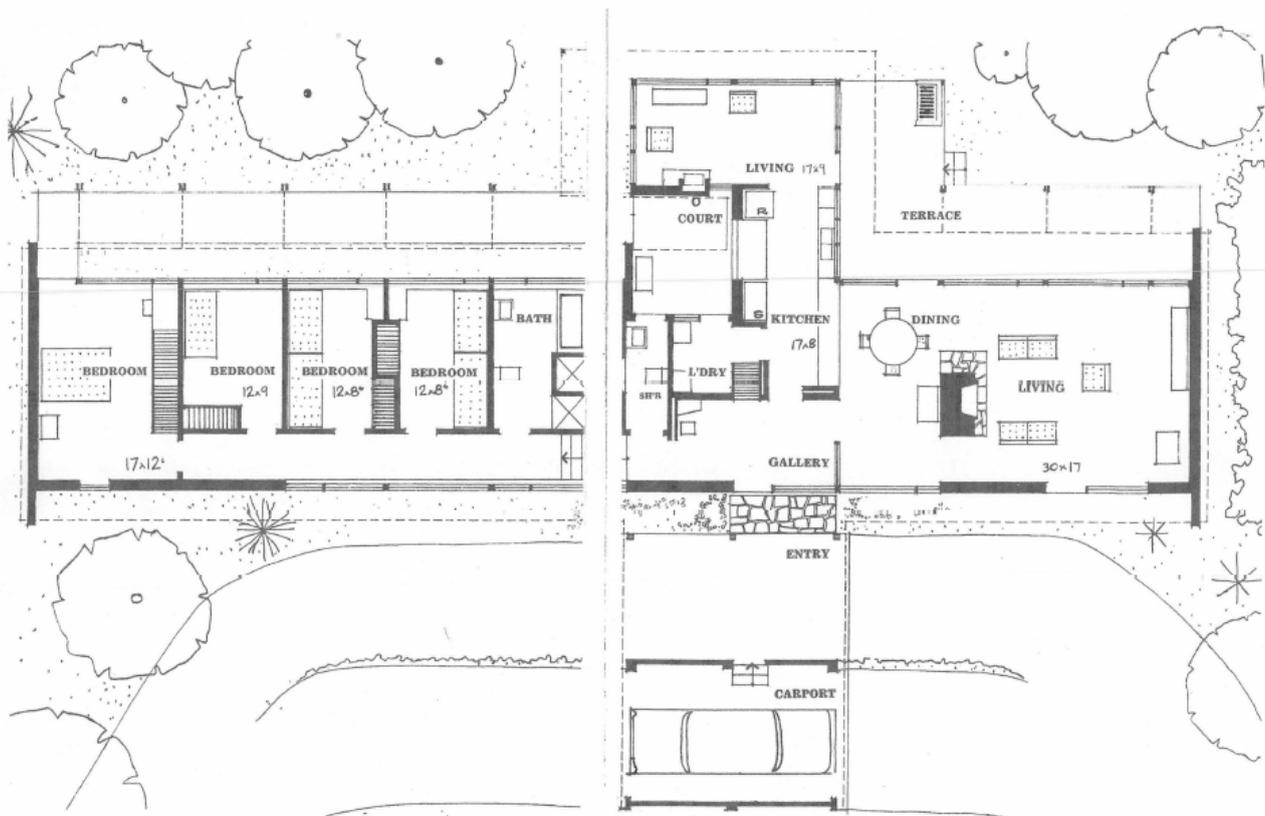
Original floor plan of Mackie House (from Clerehan 1961).
